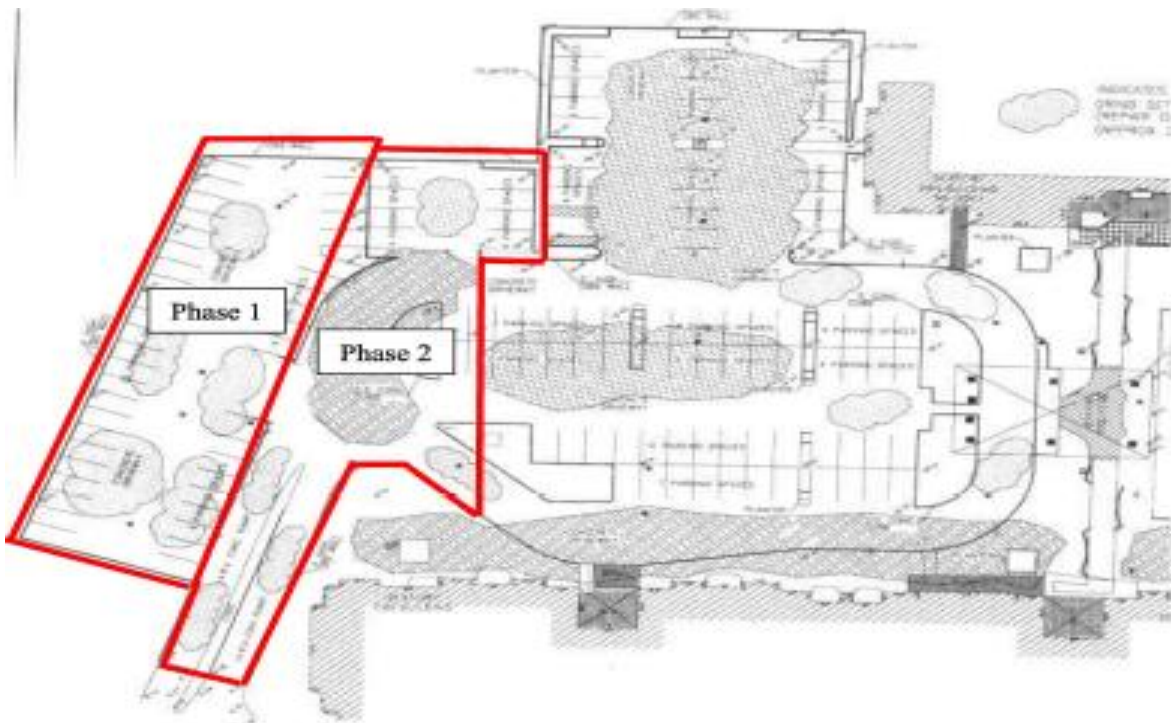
Plaza Del Prado West Garage Phase I & II – Plan View
